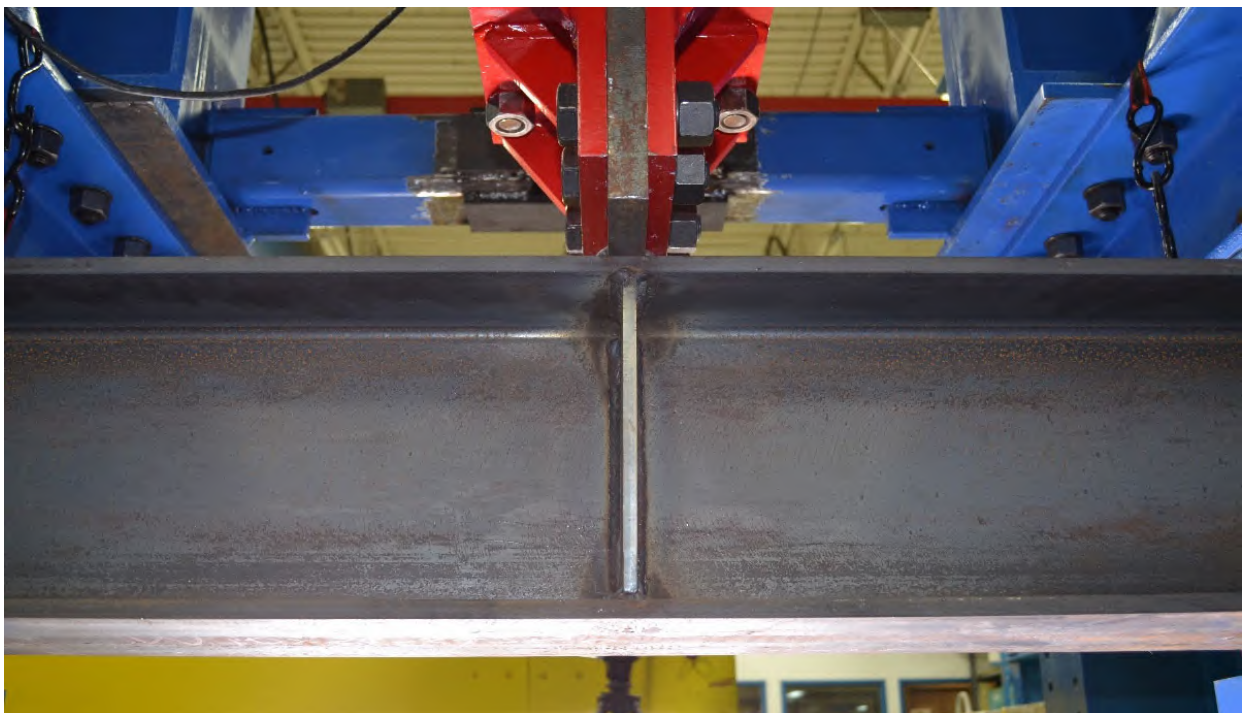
Weld condition of W10X39-ST-E2 after testing (Side 1)
